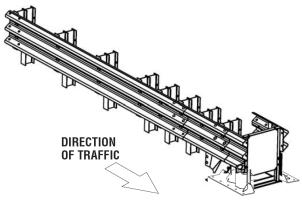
Thrie-Beam to Guardrail Connection Panel
